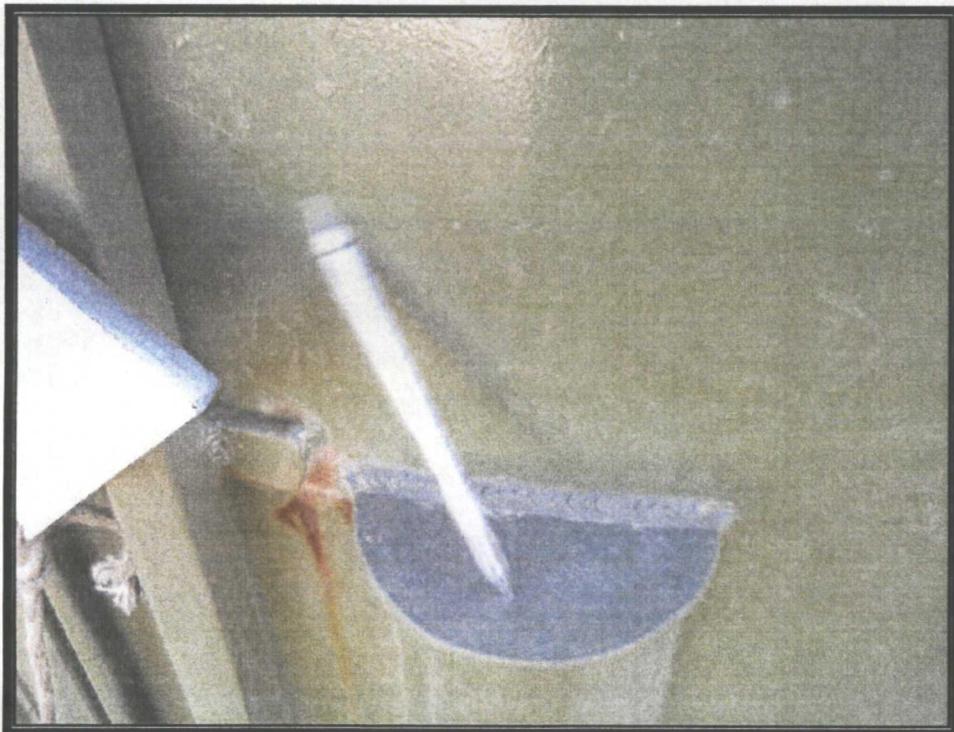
"Dräger" Tube used for H₂S Monitoring (View 7)
